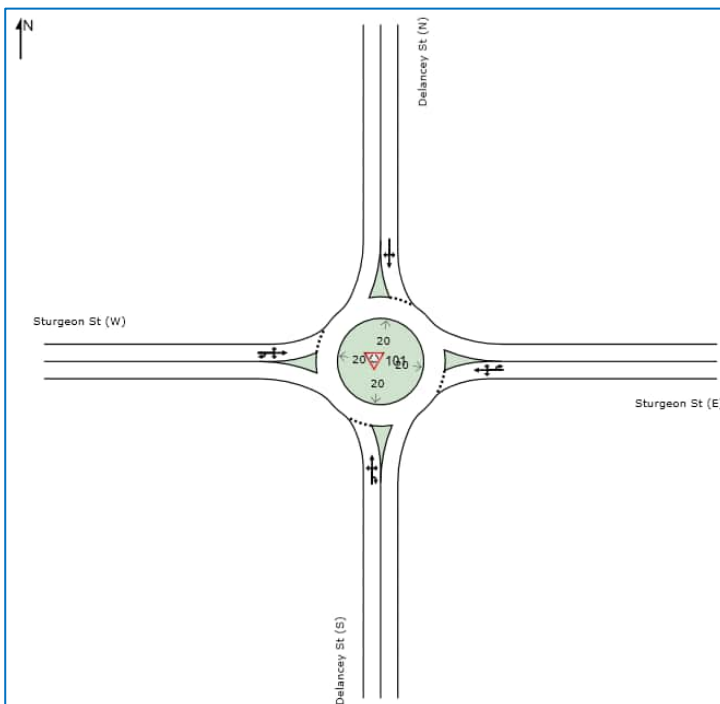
SIDRA Generated Layout of the Sturgeon Street / Delancey Street Intersection.
